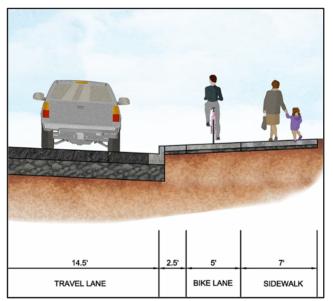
Elevated Bike Lane and Sidewalk Alternative (MM3).
